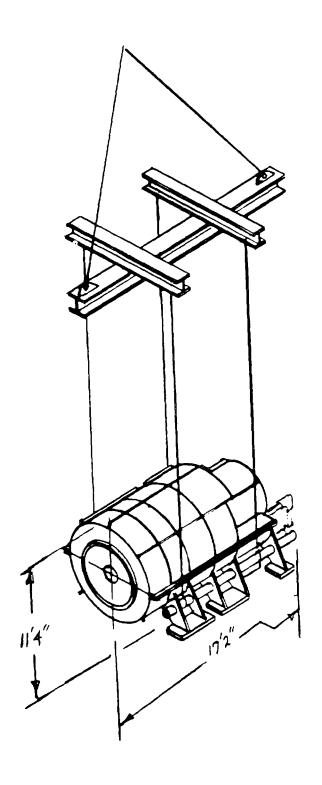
Gearbox Erection Module 160,000 lbs. with Spreader Bar and Slings
